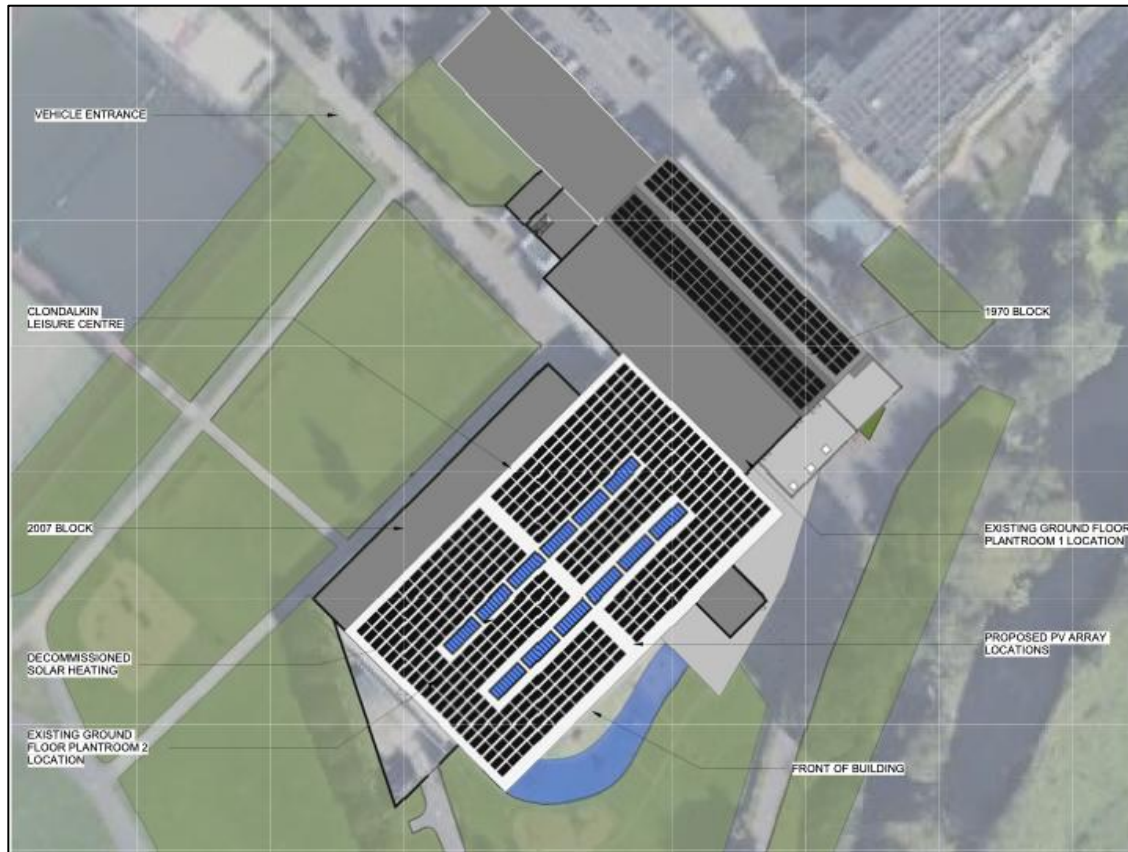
Extract from drawing "SDC2401-ALT-CLC-XX-DR-U-01005" showing the roof layout with the proposed PV panels.
